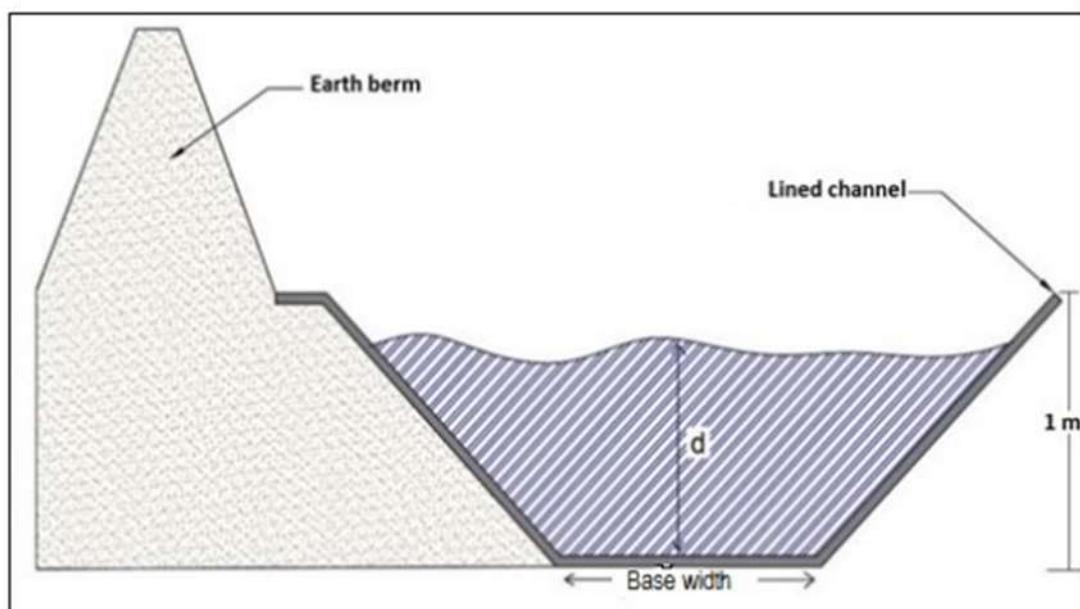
Conceptual design of storm water drain with an adjoining berm
